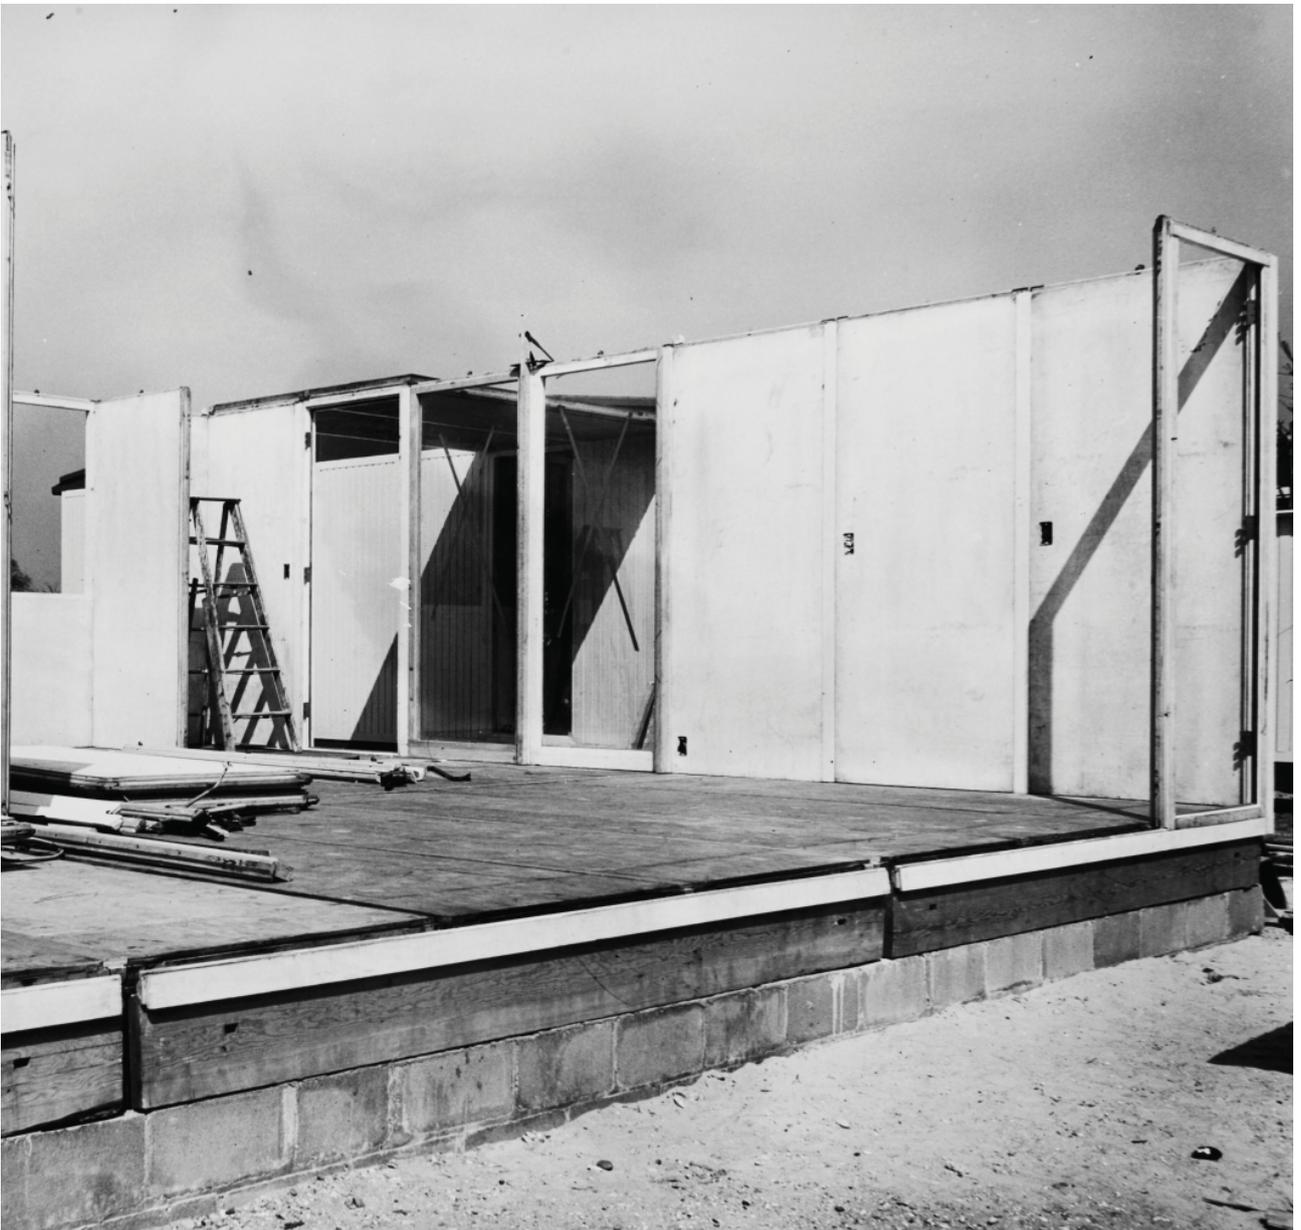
The Packaged House System. Built prototype. 1947
